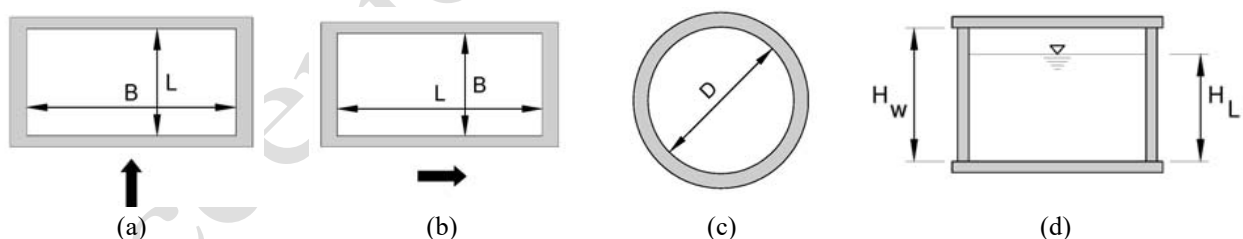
Definition of the geometric parameters for the tank models: (a) Plan view of a rectangular tank under transverse seismic loading; (b) Plan view of a rectangular tank under longitudinal seismic loading; (c) Plan view of a cylindrical tank; (d) Elevation view of both rectangular and cylindrical tanks.
